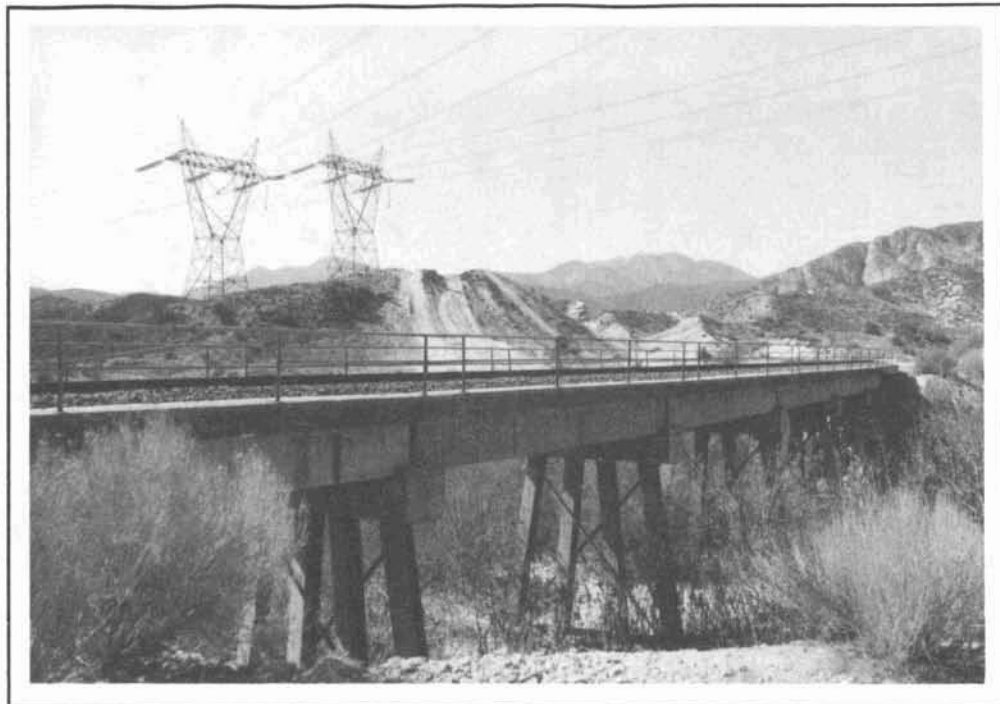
Concrete Beam Railroad Bridge in Cajon Creek Near Cajon Junction
